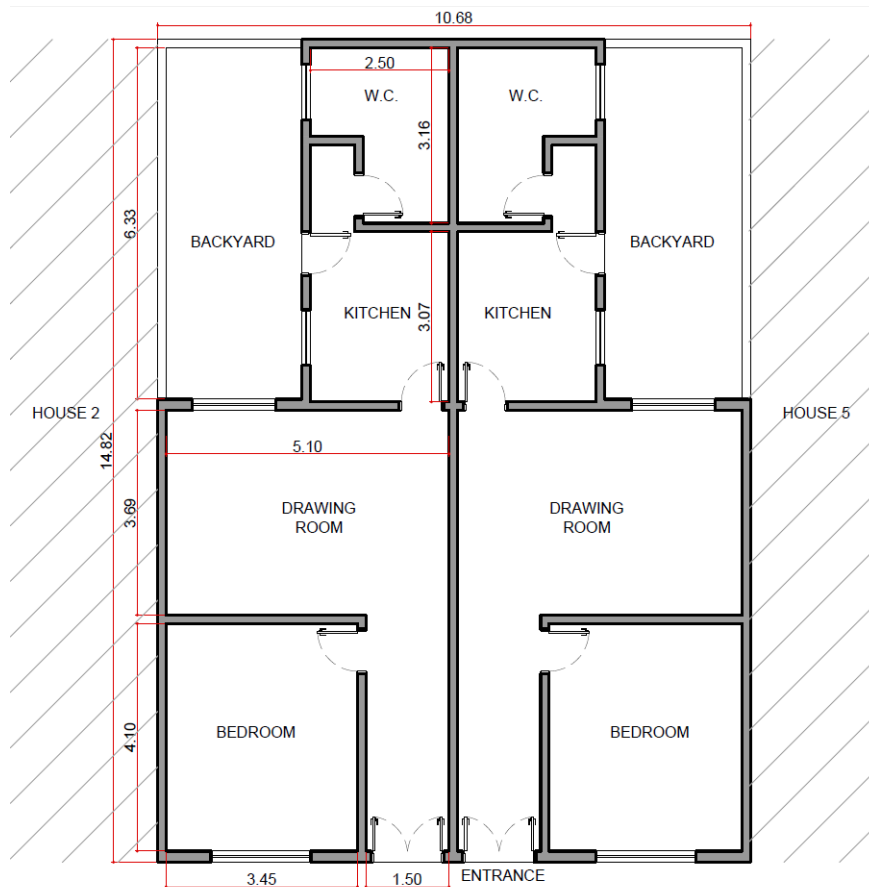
Floor plan of working-class house built by the private developer Economizadora, in 1910, in São Paulo.
